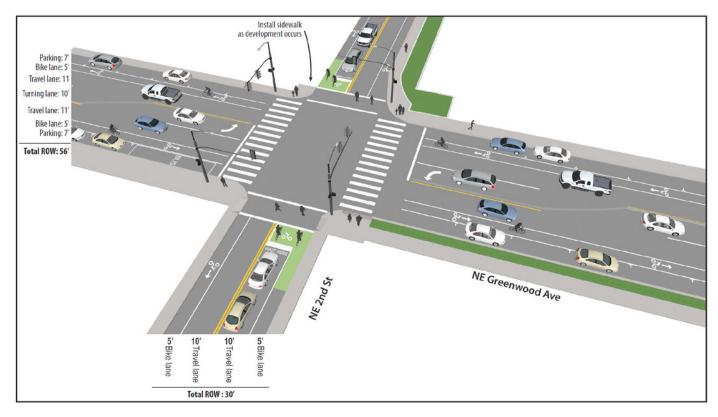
Greenwood at 2nd Crossing Treatment with 3-Lane Cross-Section
